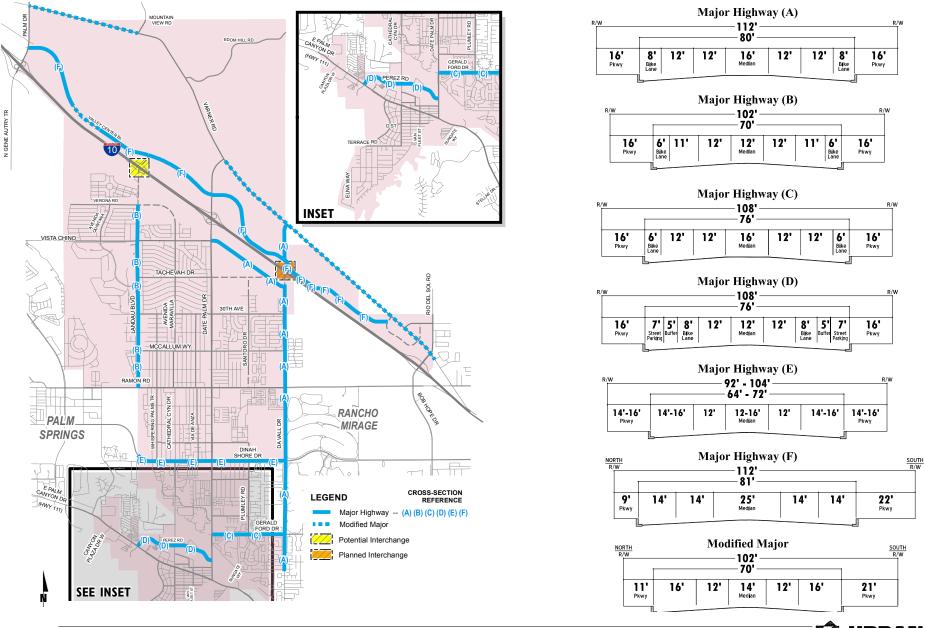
PROPOSED GENERAL PLAN ARTERIAL CLASSIFICATIONS
